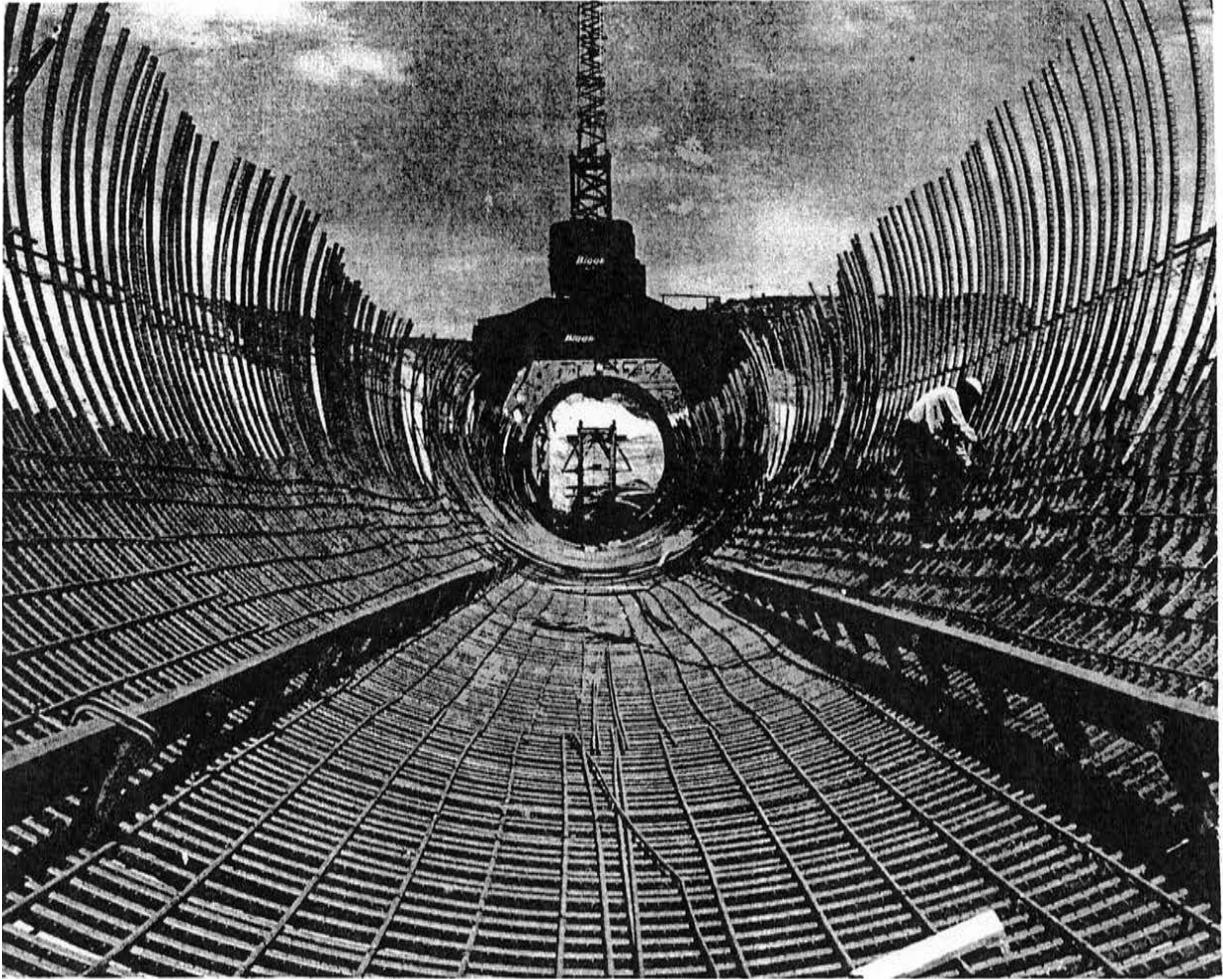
Steel reinforcement being placed on a portion of the Soap Lake Siphon. The crane in the center is placing a section of the steel-plate liner in position.
